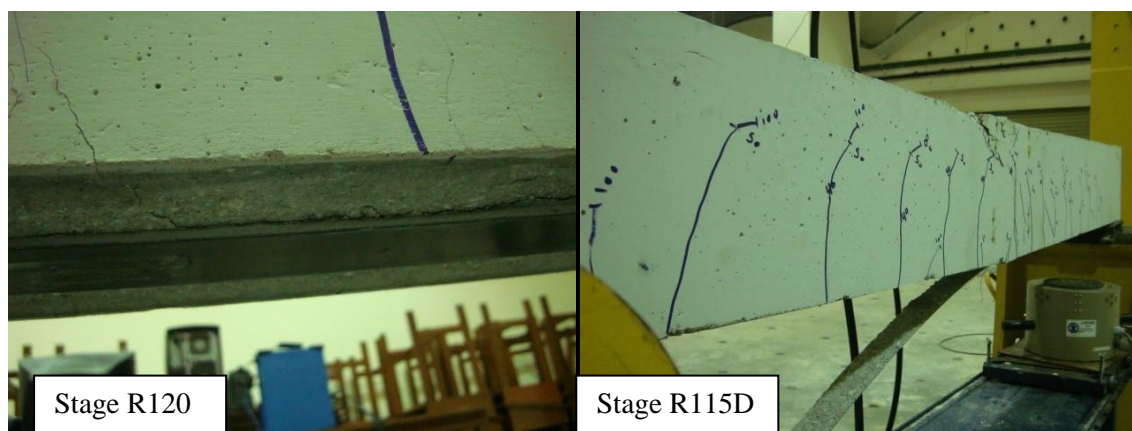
Induced IC debonding and failure mode for beam B112m
